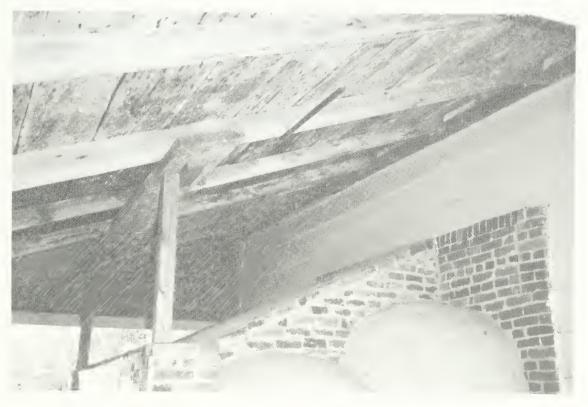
Kitchen wing, east elevation, porch roof over exterior bake ovens.
